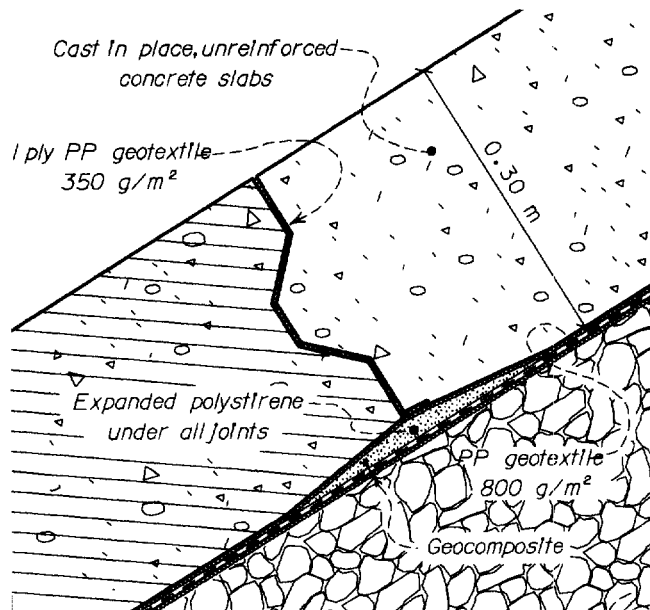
Cross section of the waterproofing system used at Bovilla dam.
